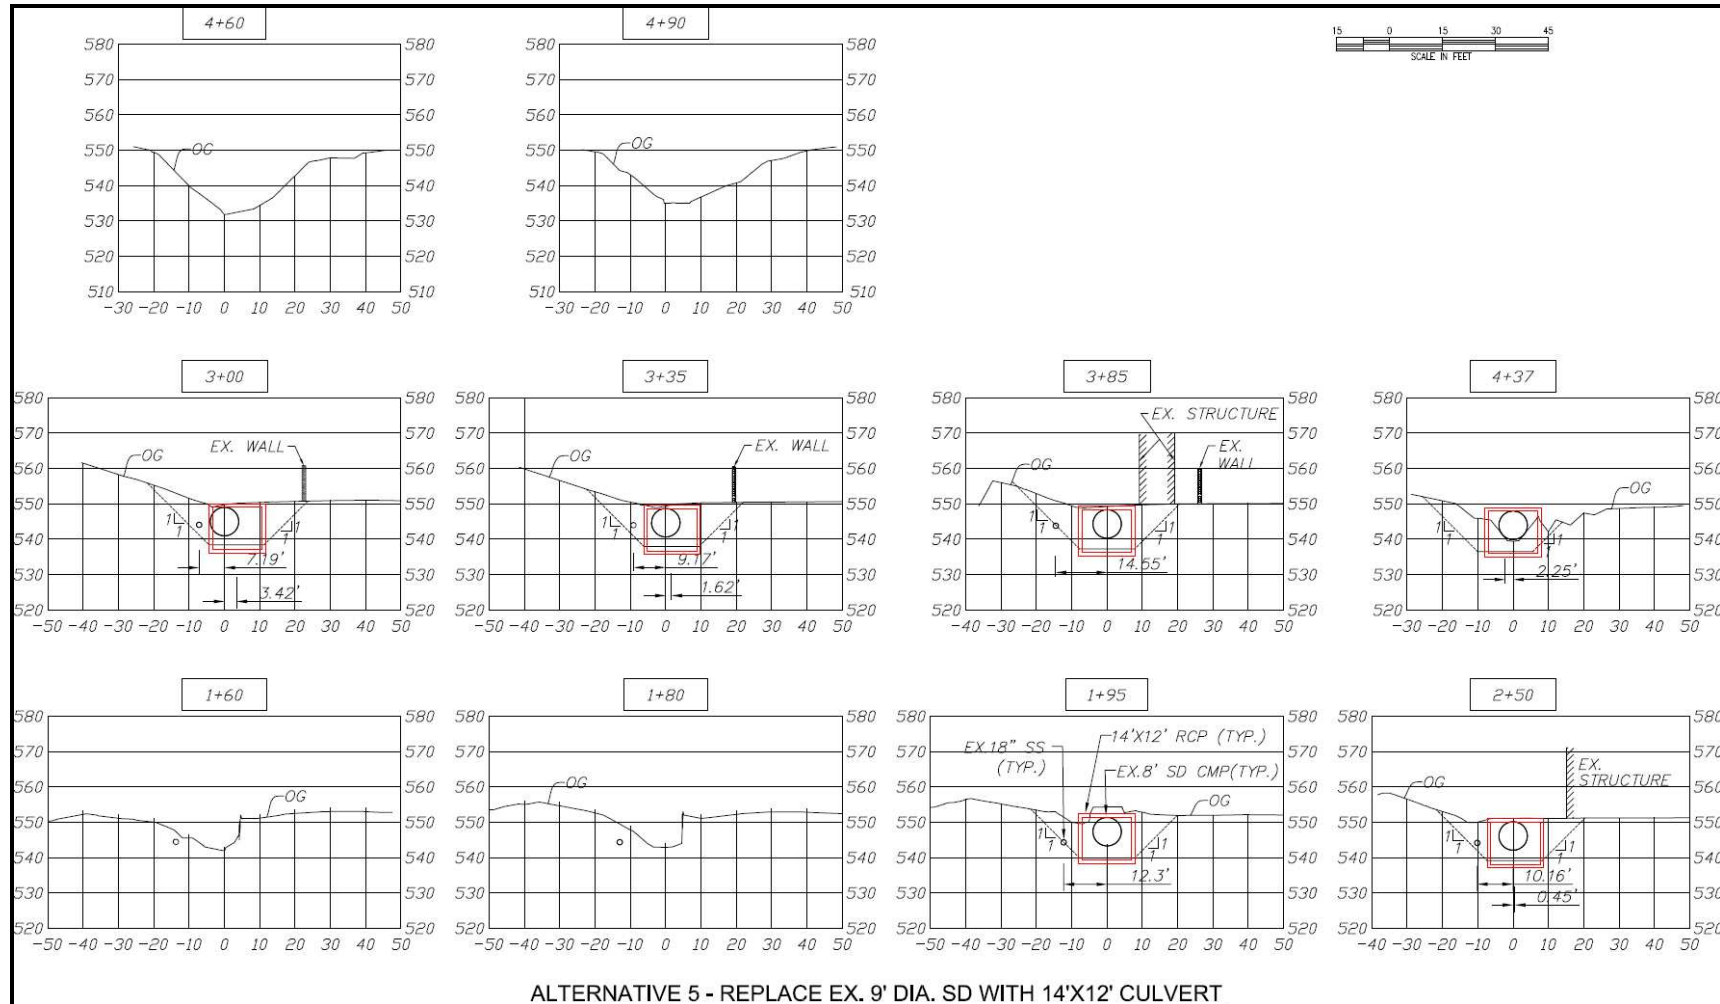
Cross Sections for Alternative 5 – Replace Existing Culvert with 14-ft by 12-ft Box Culvert
